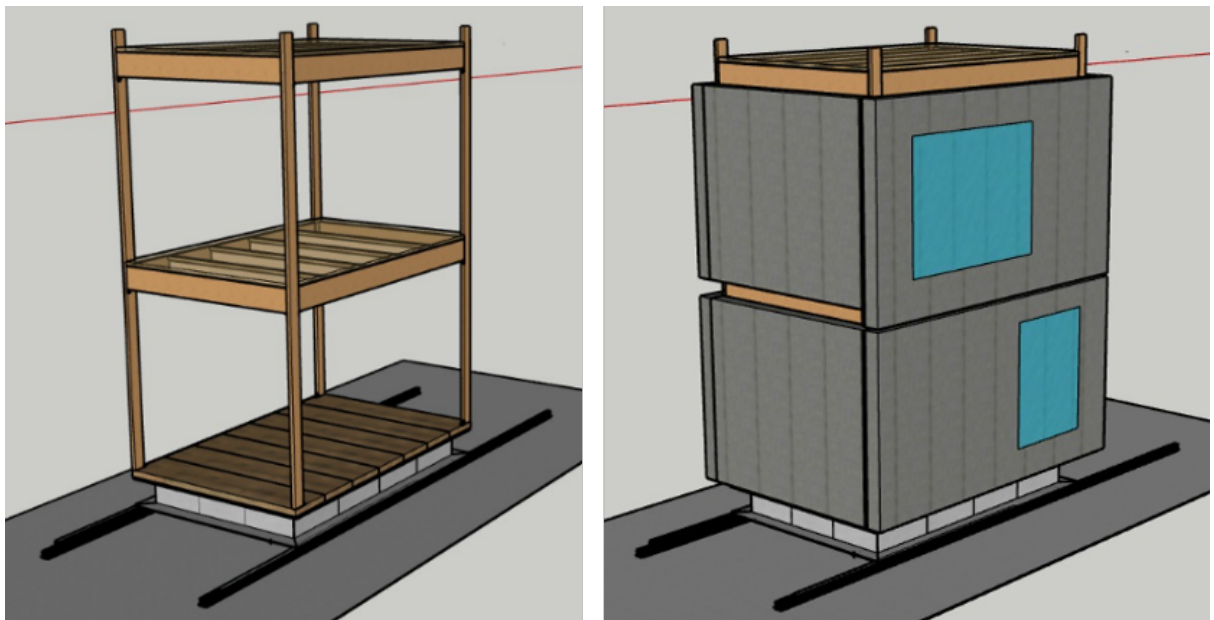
Timber host structure (left) and the structure covered with WEBO panels (right)
